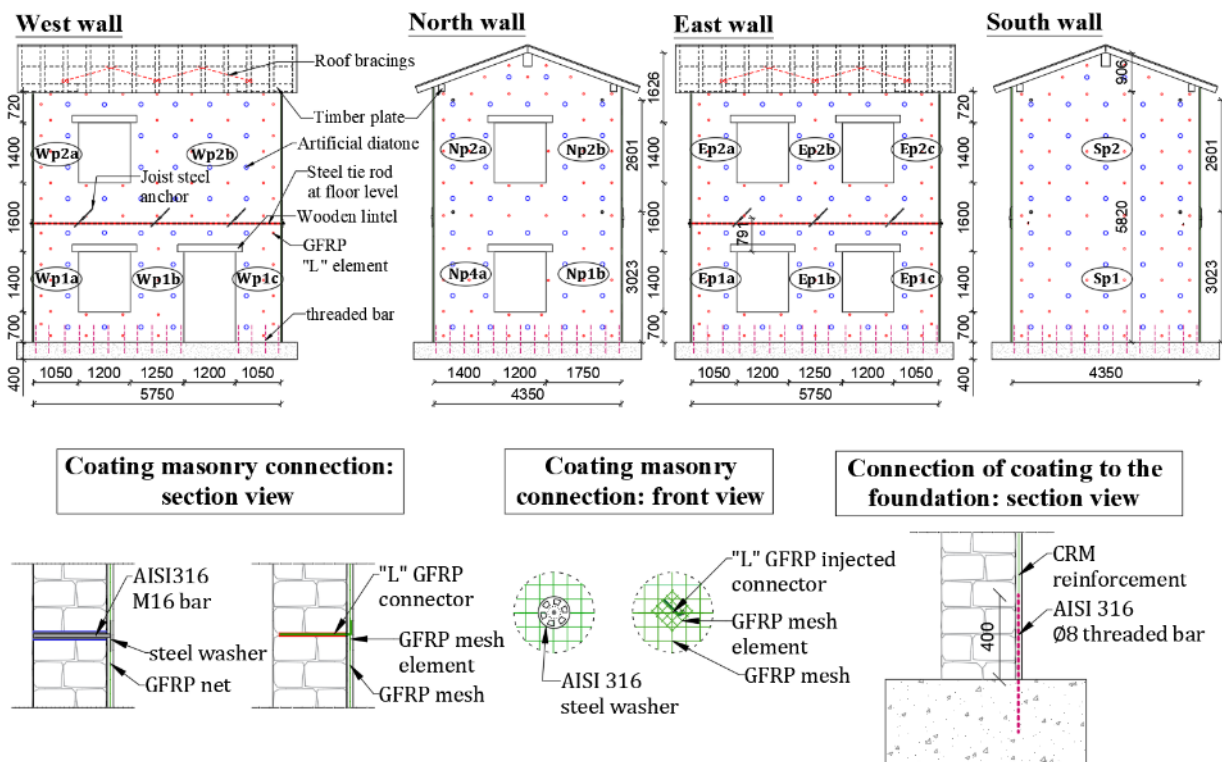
Strengthening the structure by GFRP mesh reinforced coating and anchoring.
